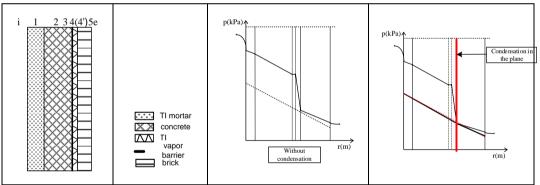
The assembly layout and water vapor diffusion diagrams in the assembly 3
